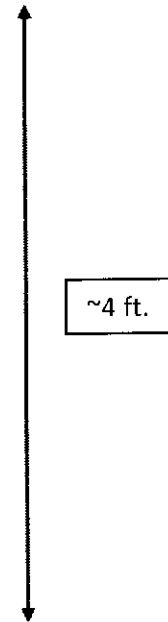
Full length of rebar “probe” used to determine depth of cavities.
